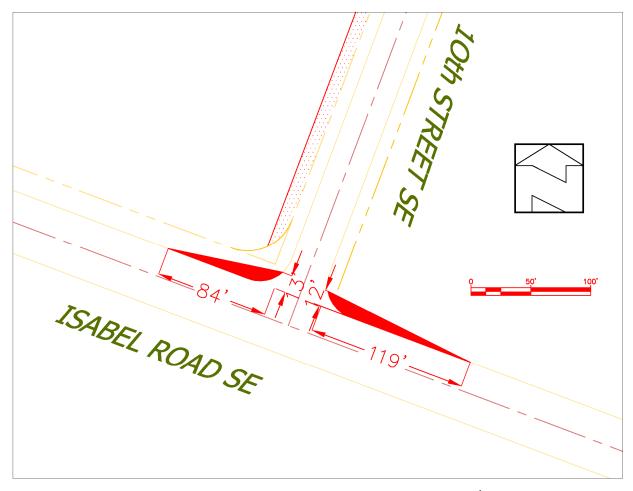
Sight Distance Layout for Isabel Boulevard and 10<sup>th</sup> Street
